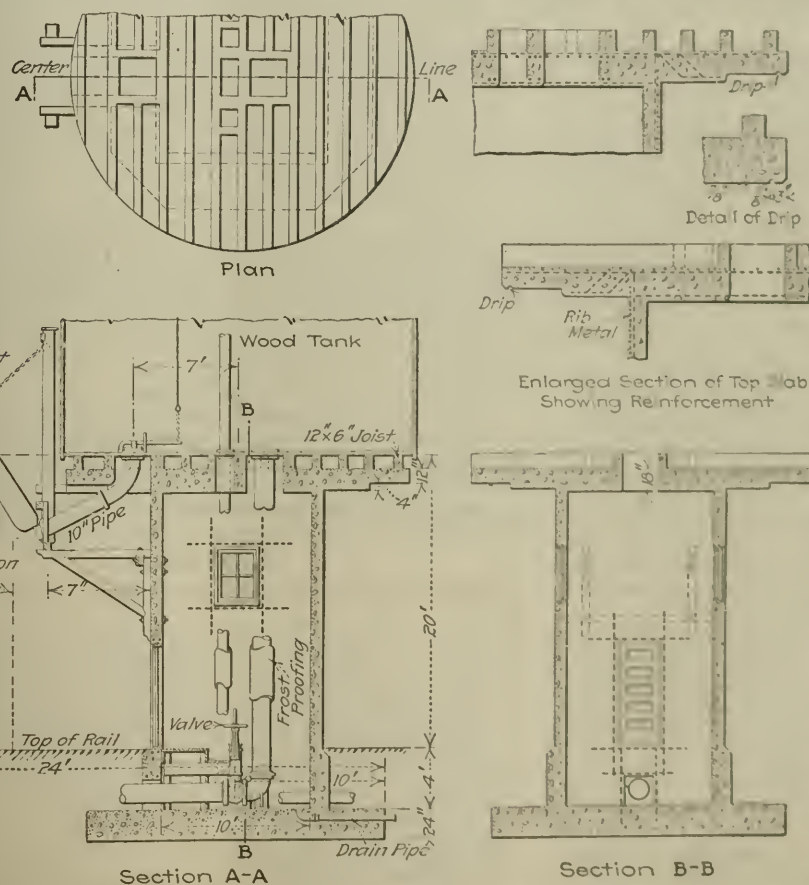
DESIGN OF CONCRETE TOWER FOR WATER TANKS
